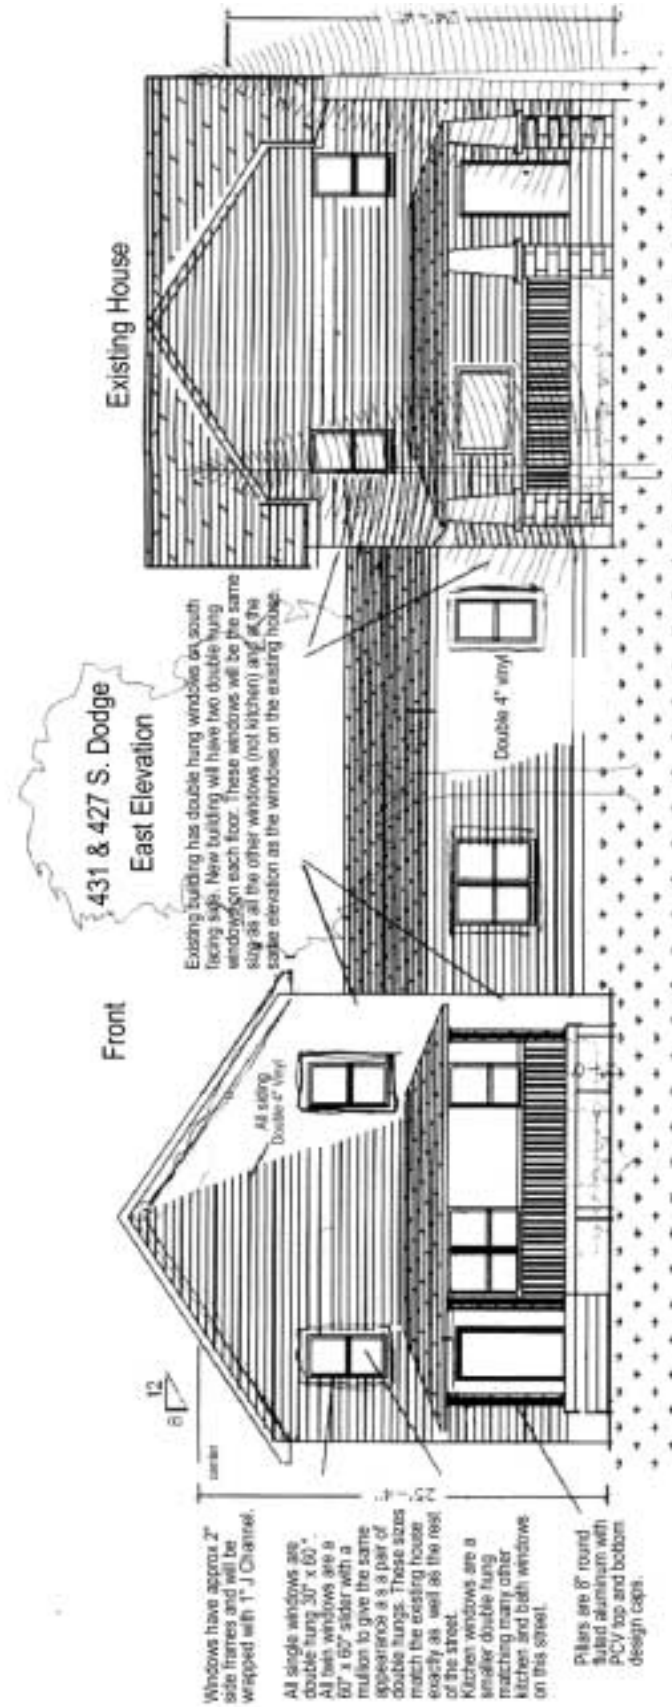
New Construction Plan Implementing Central Planning District Multi-family Residential Standards. (Source: City of Iowa City.)
